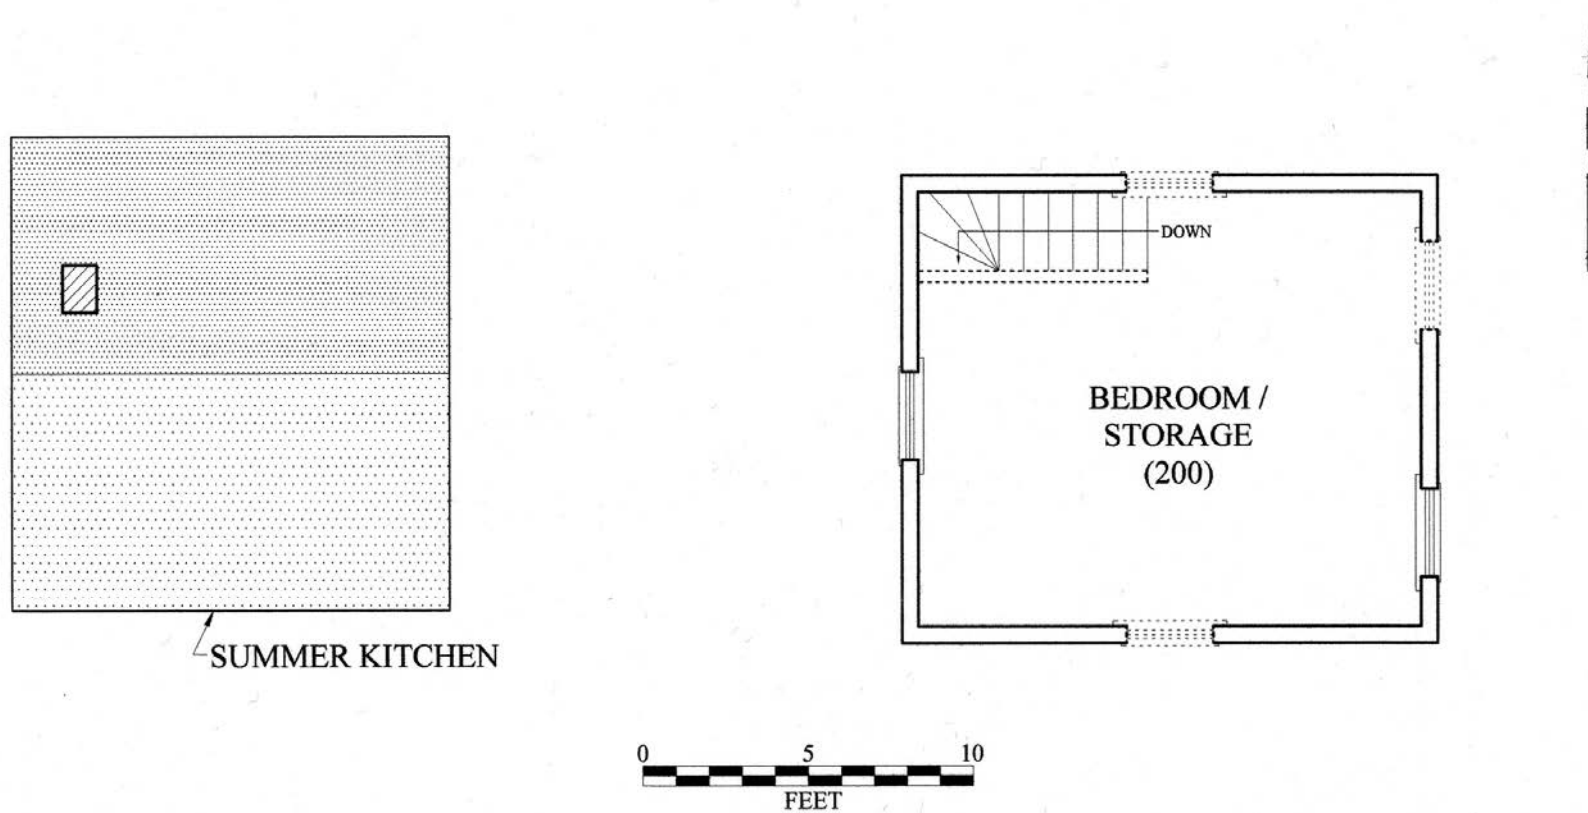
Second floor plan of the residence at the Sibley Tenant Farmstead, circa 1880.
